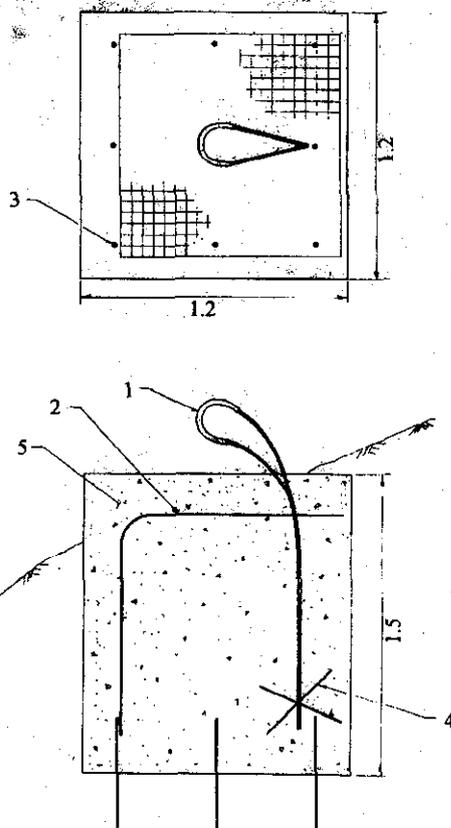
Uphill foundation block showing (1) anchor uphill, (2) chicken wire mesh, (3) dowel bars, (4) cross bars, and (5) concrete M20.
